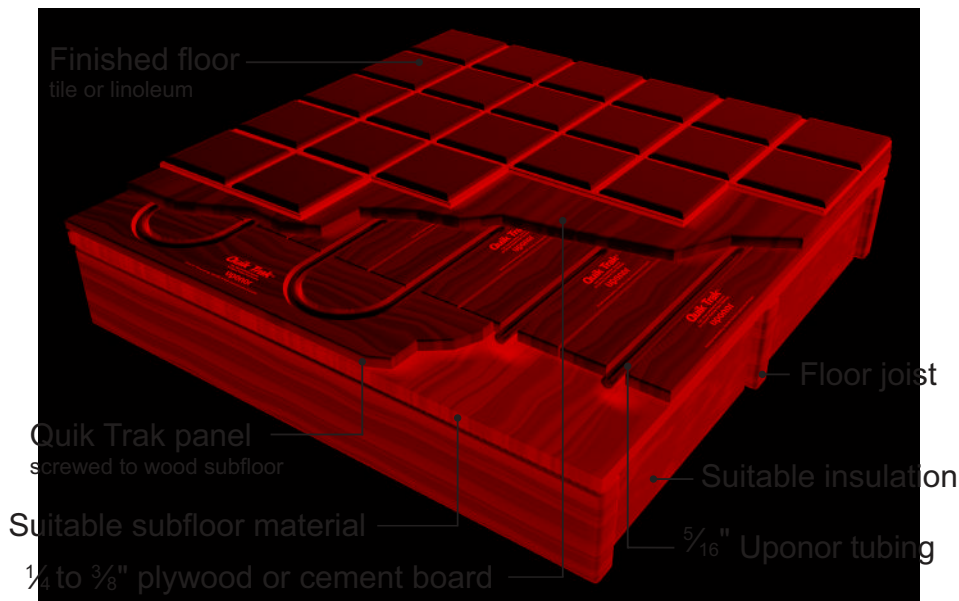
Quik Trak over a wood subfloor with tile/linoleum floor covering
